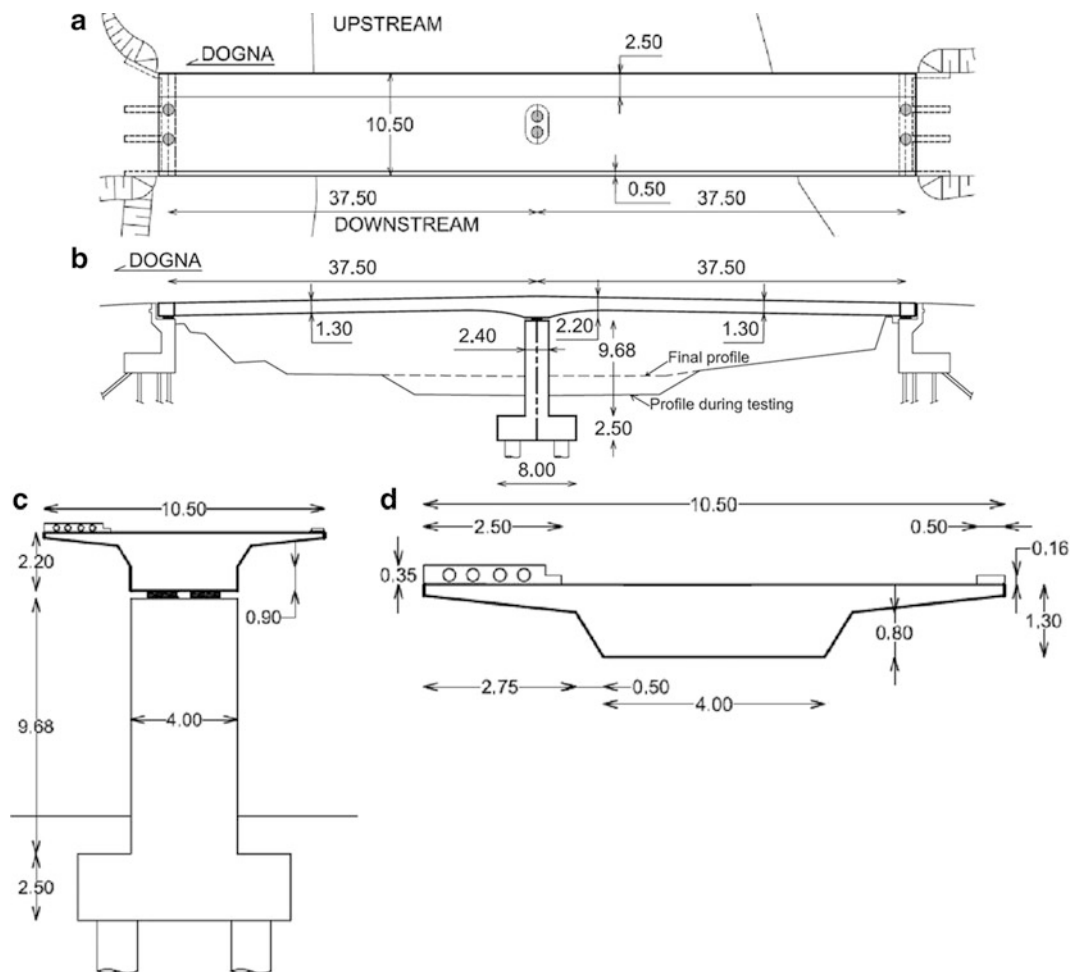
Dogna bridge: (a) plan; (b) elevation; transversal cross section at pier (c) and at mid-span (d) Length in meters
